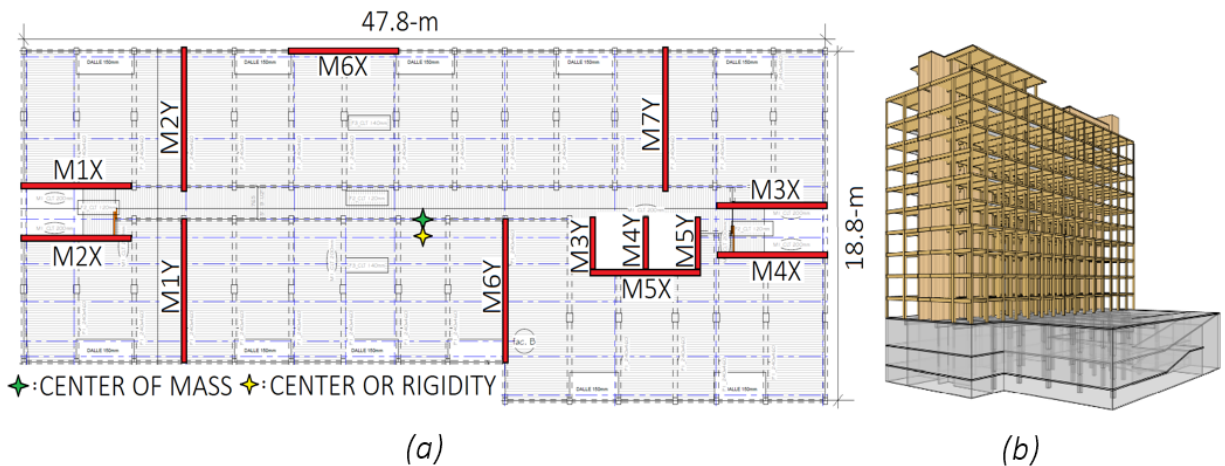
Case study building : (a) Plan view, and (b) 3D view)
